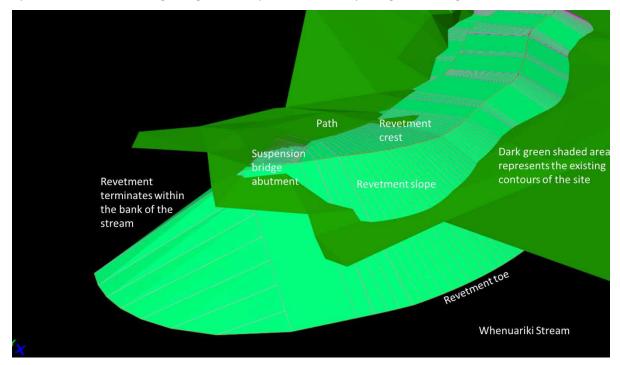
3D visual of the rock revetment end detail as the path transitions to the suspension bridge.
